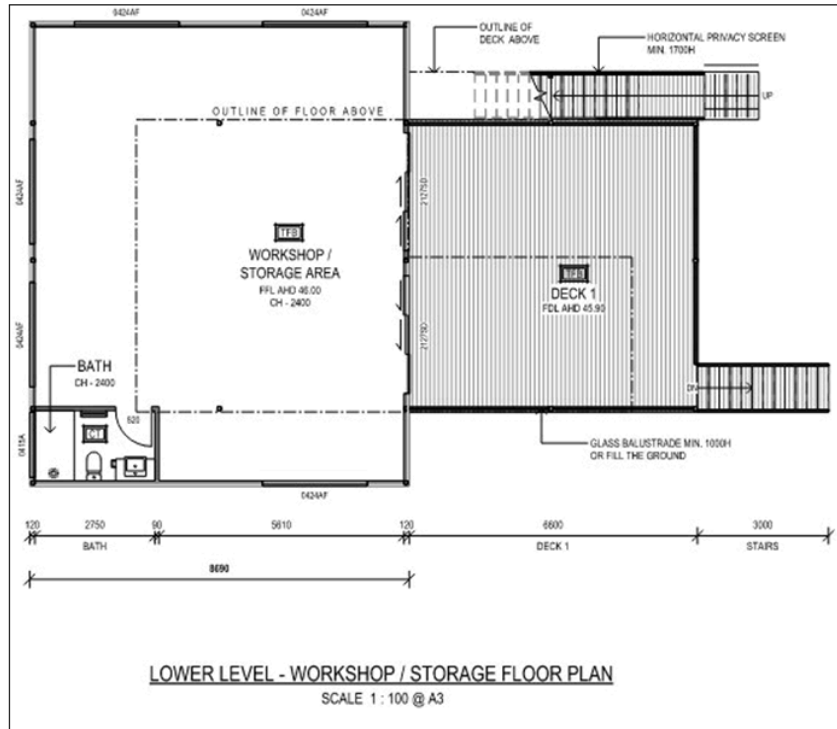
lower level floor plan of the proposed building at 127 warwick Street, West Hobart.
